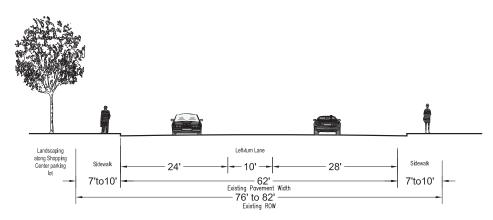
TYPICAL SECTION - RESIDENTIAL STREET
